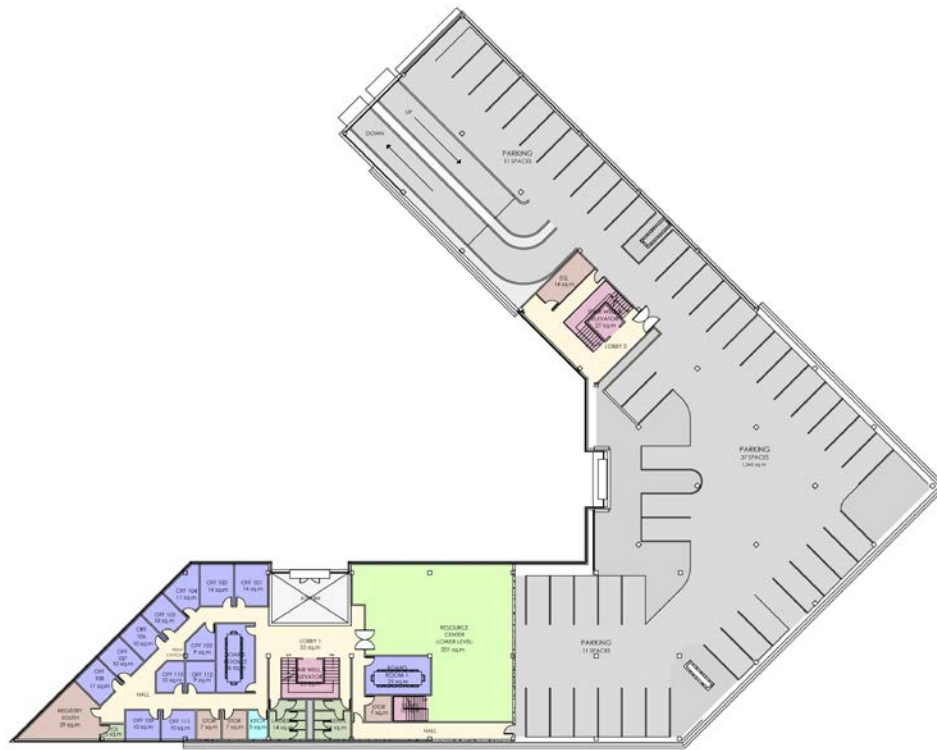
First Floor Plan (source: A+ Urban Technics)
